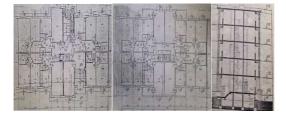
The standard project T770-IPCT Pb4; horizontal section of the ground floor on the left, horizontal section of the current floor in the middle and vertical section on the right
